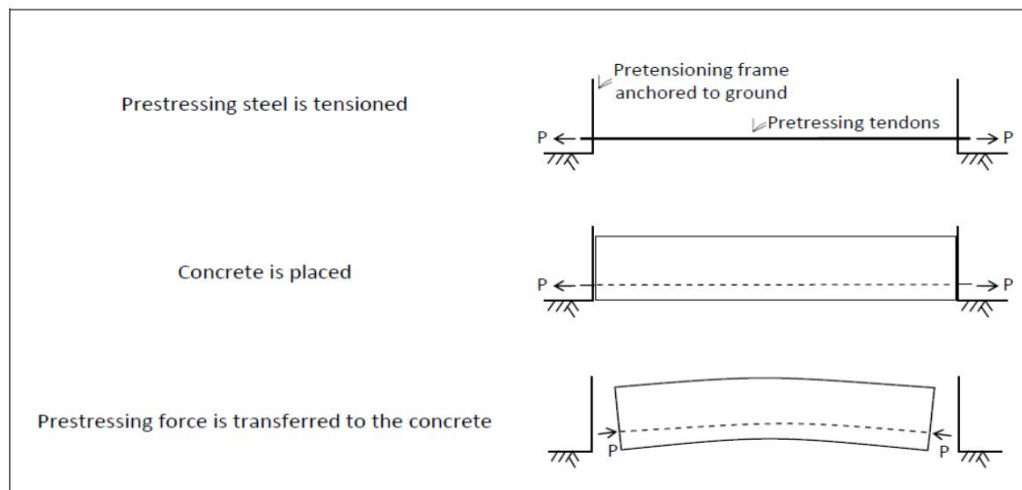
Construction Sequence for Pre-Tensioned Concrete Beam
